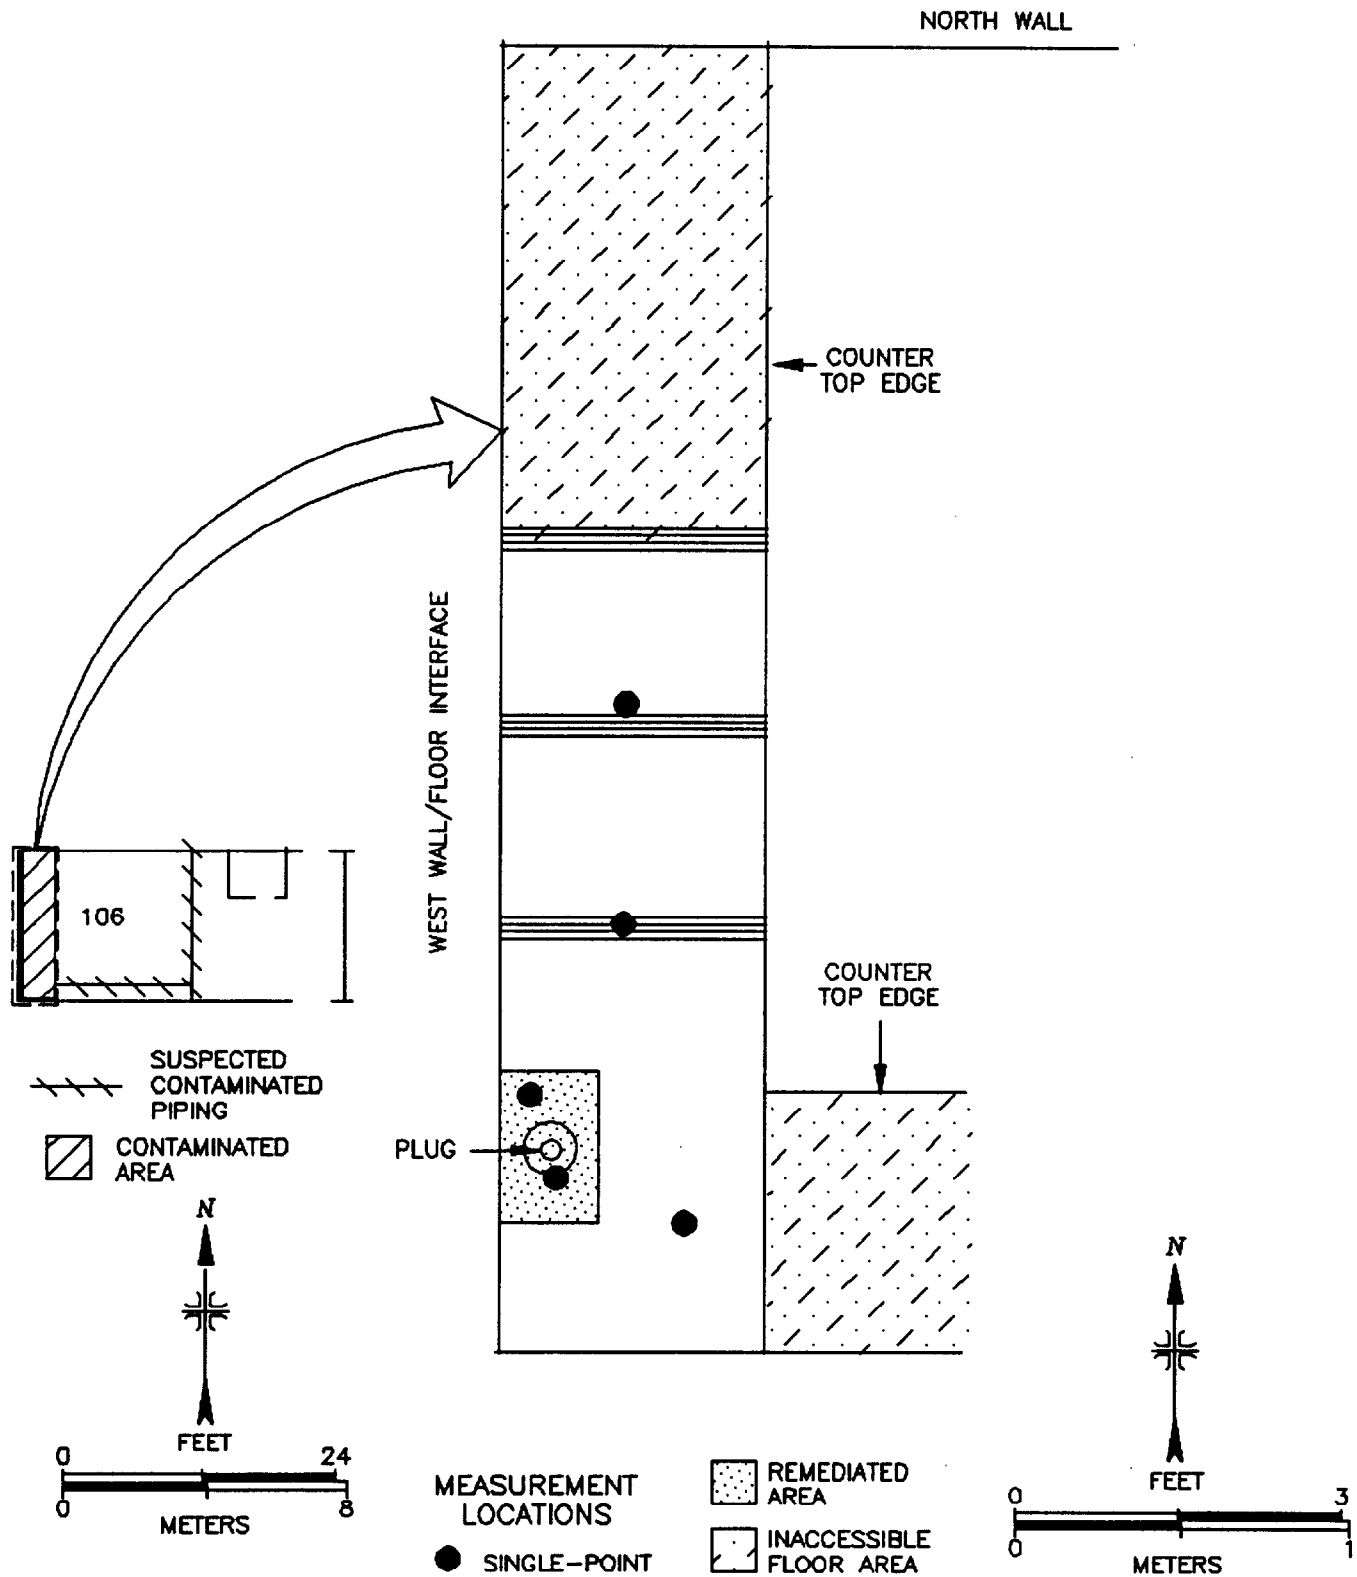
Building 29, Room 106, Floor Beneath Counters – Measurement Locations
